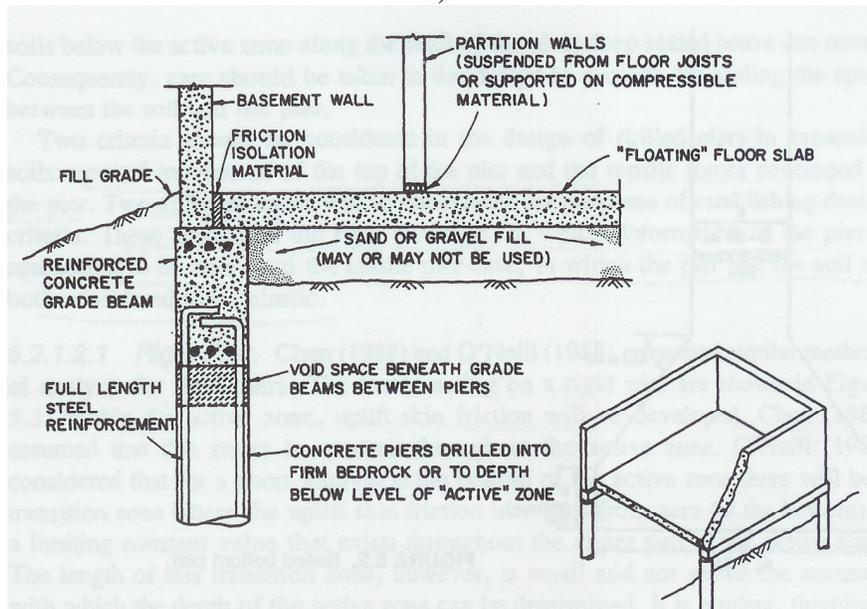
Illustration of a Pier and beam foundations (Nelson and Miller, 1992)
